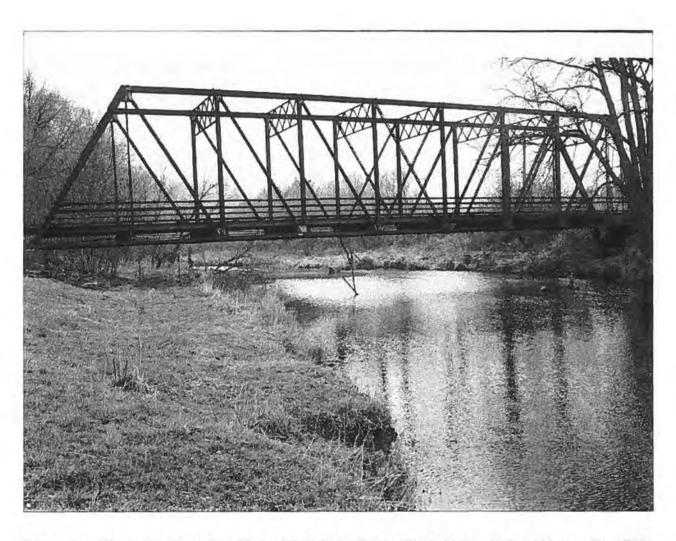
Riveted construction; Wagon Trail Road Bridge (B-47-006) built in 1909 over Eau Galle River, Pierce County. (Source: HAER No. WI-31).
